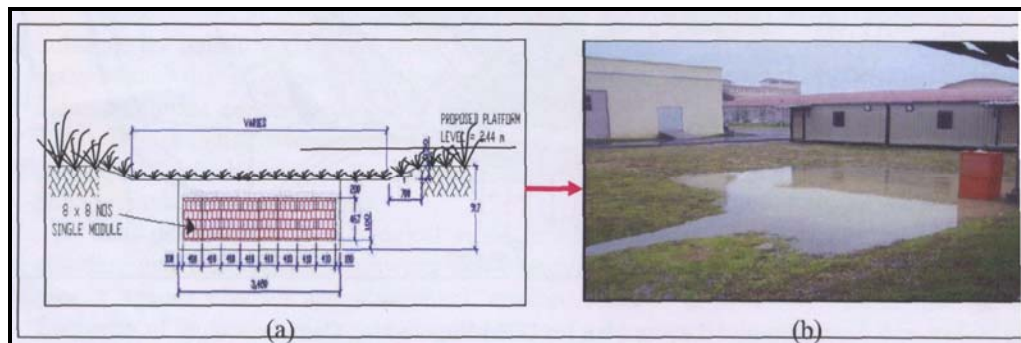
Dry Pond (a) Cross section (b) View of dry pond during rainfall event
